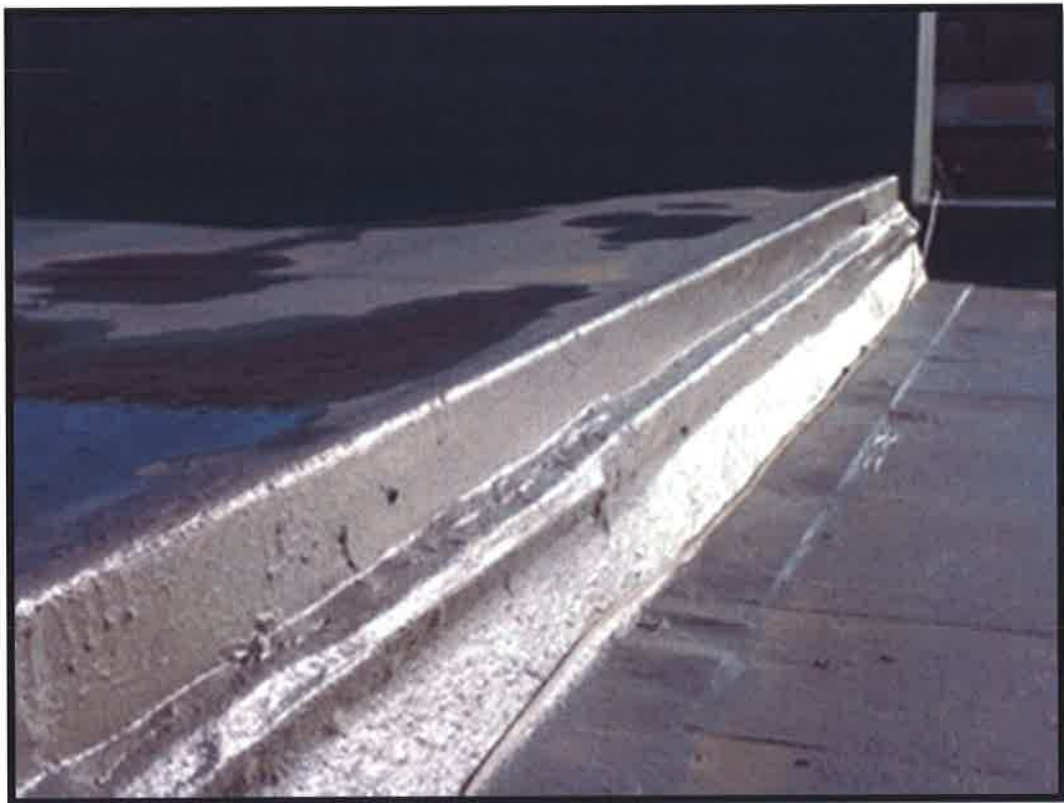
Rear section of flat roof at kitchen/utility room junction with ponding over kitchen.
